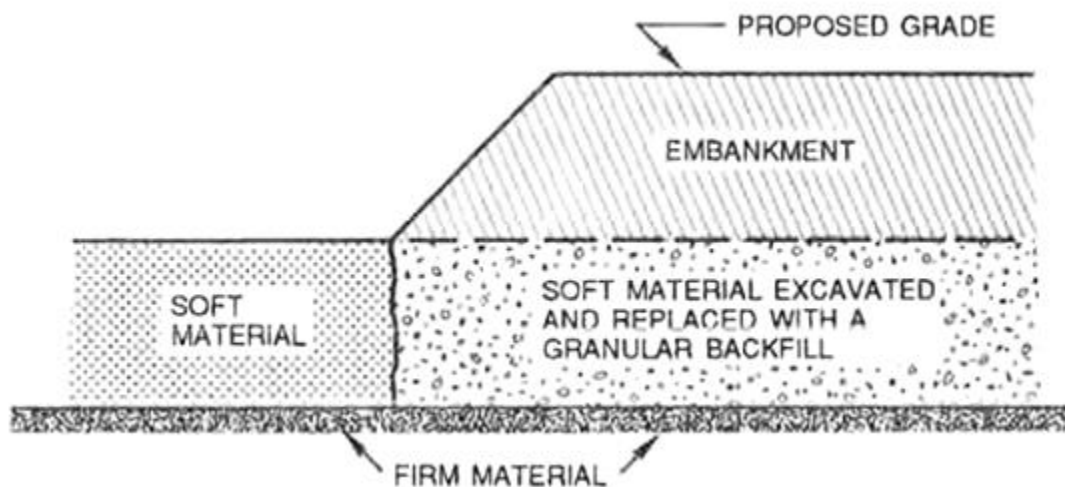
Complete excavation and replacement of soft material below a proposed embankment (Ariema and Butler 1990.)
